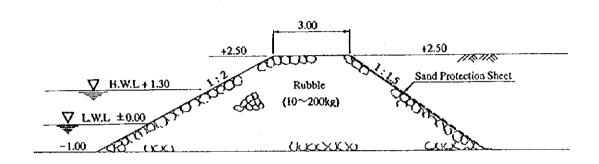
(3) Typical Cross Section of Revetment for Road (Rubble)
